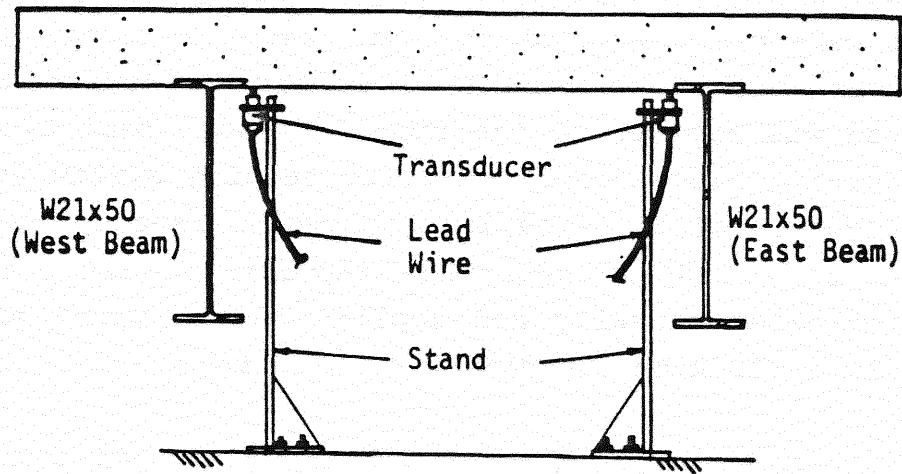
Location of Deflection Transducers on Bridge Unit (at Midspan)
